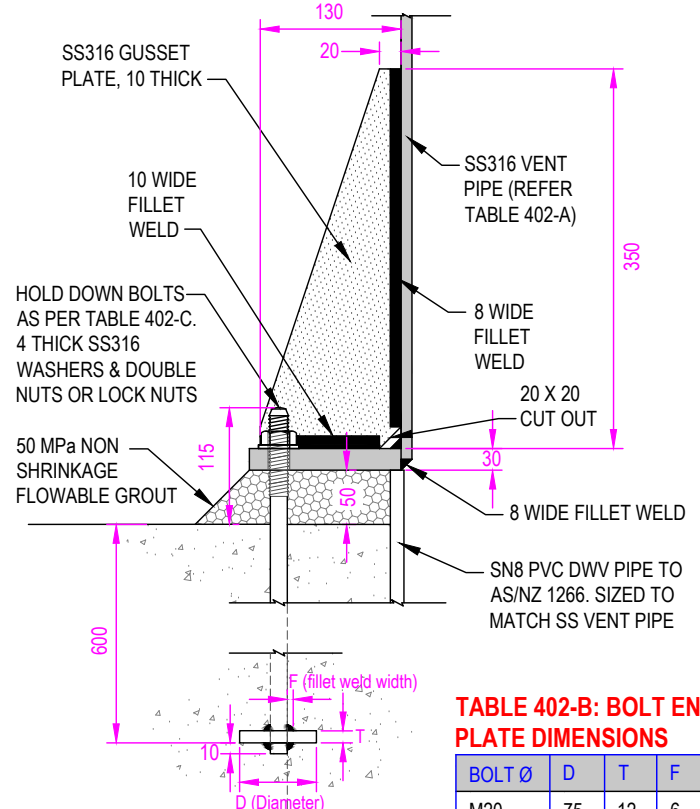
E: FLANGE MOUNTING ARRANGEMENT (ELEVATION)
